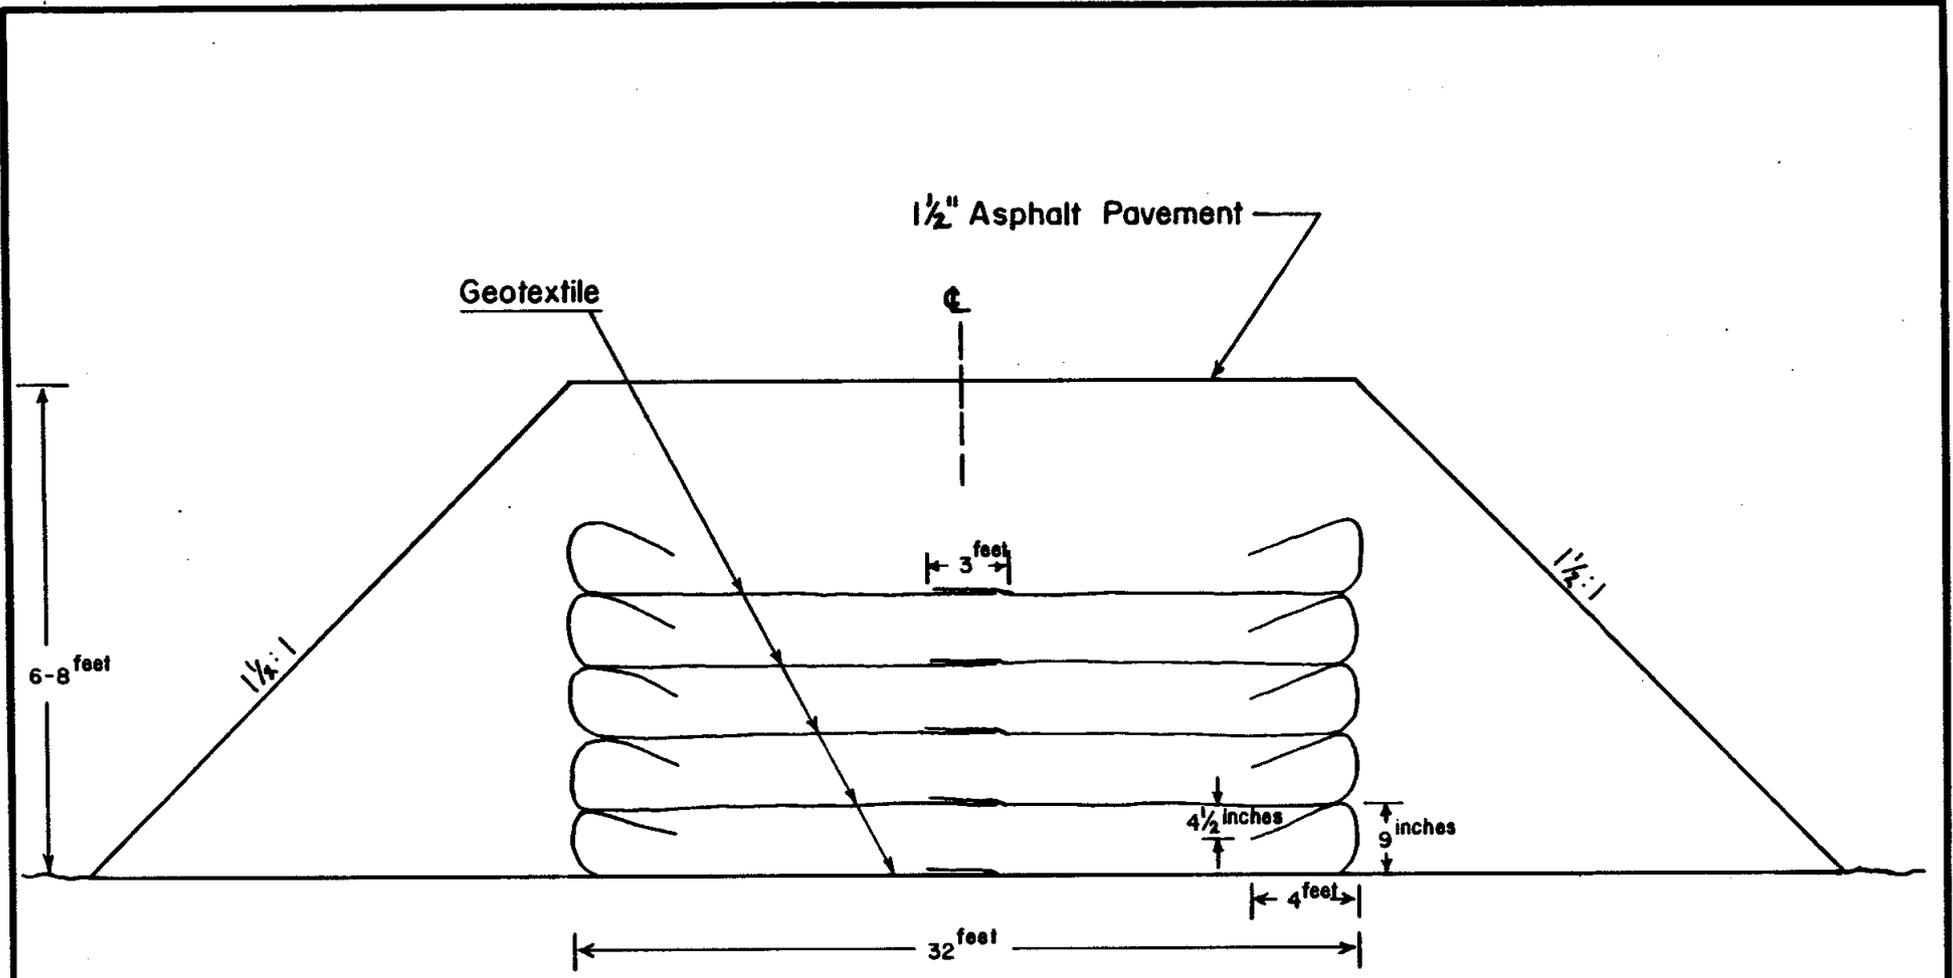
Chena Hot Springs Road Reinforced Embankment
